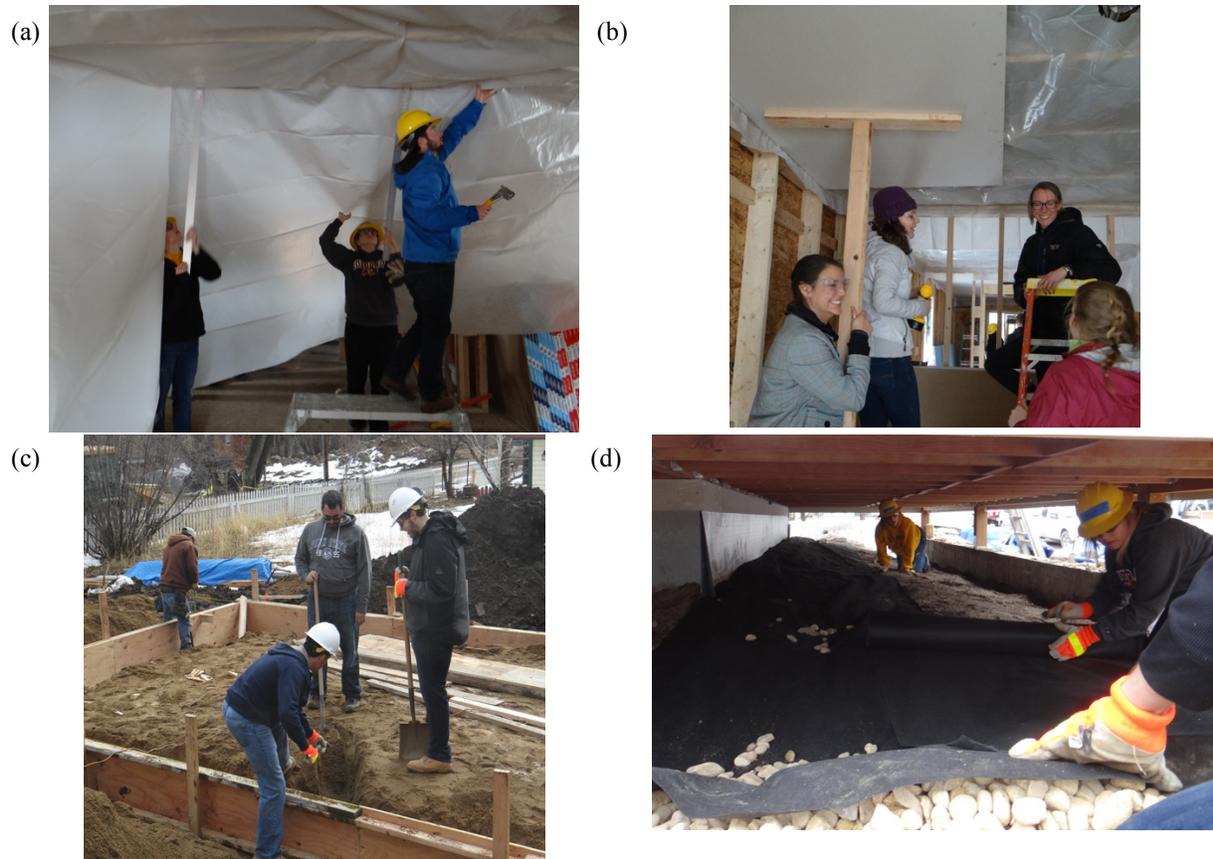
Students at the HfH worksite on March 13, 2015 working on (a) hanging the vapor barrier, (b) installing dry wall, (c) digging conduit trenches for electrical lines, and (d) placing rocks and barrier underneath the porch.
